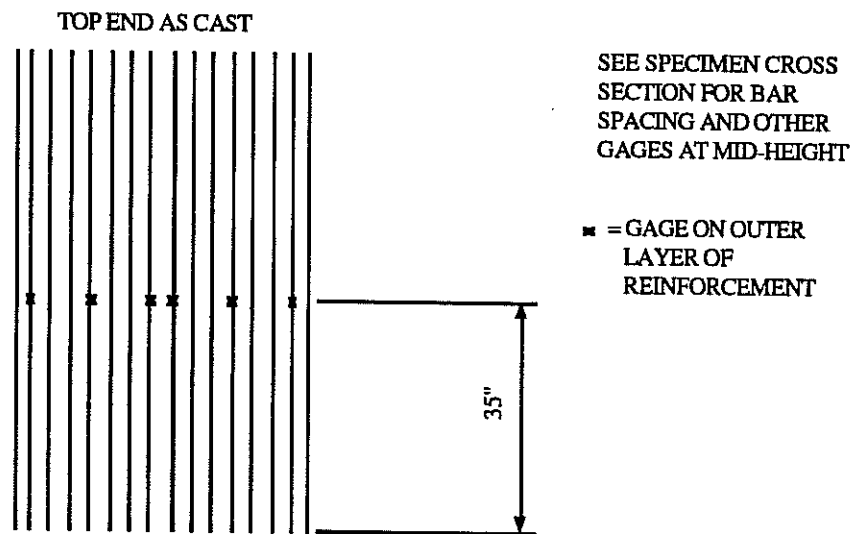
Gage Positions on Compression Face, Specimen 1M10
